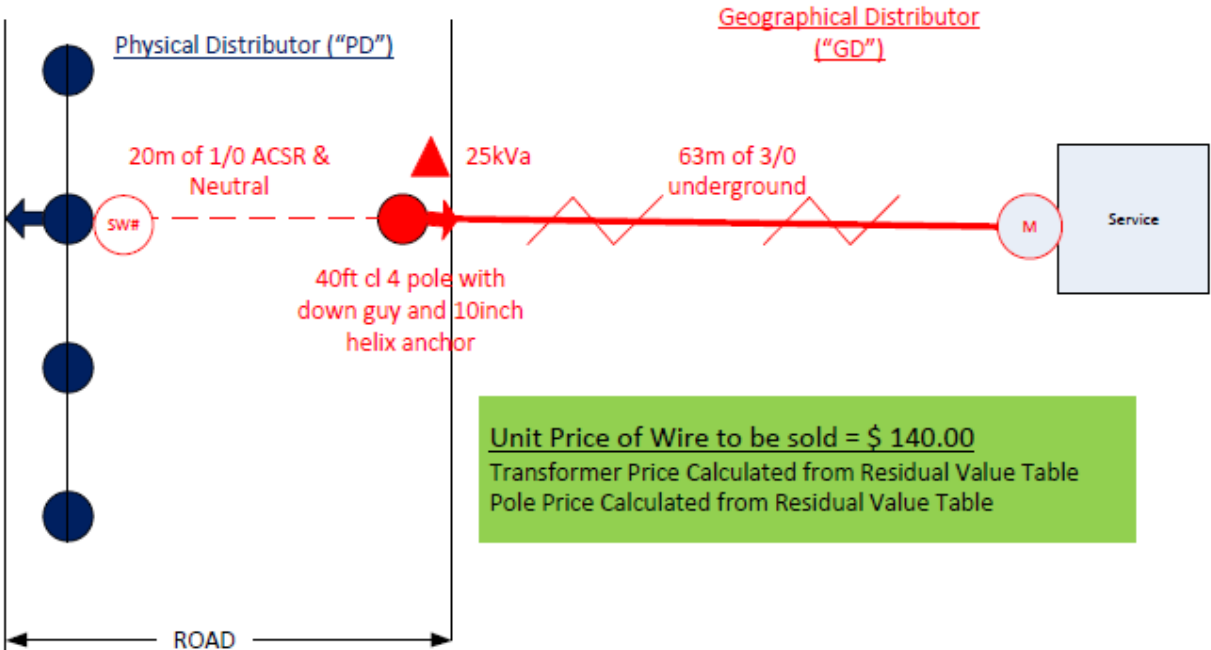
Primary “GD” supplied transformer, switch and Road crossing
